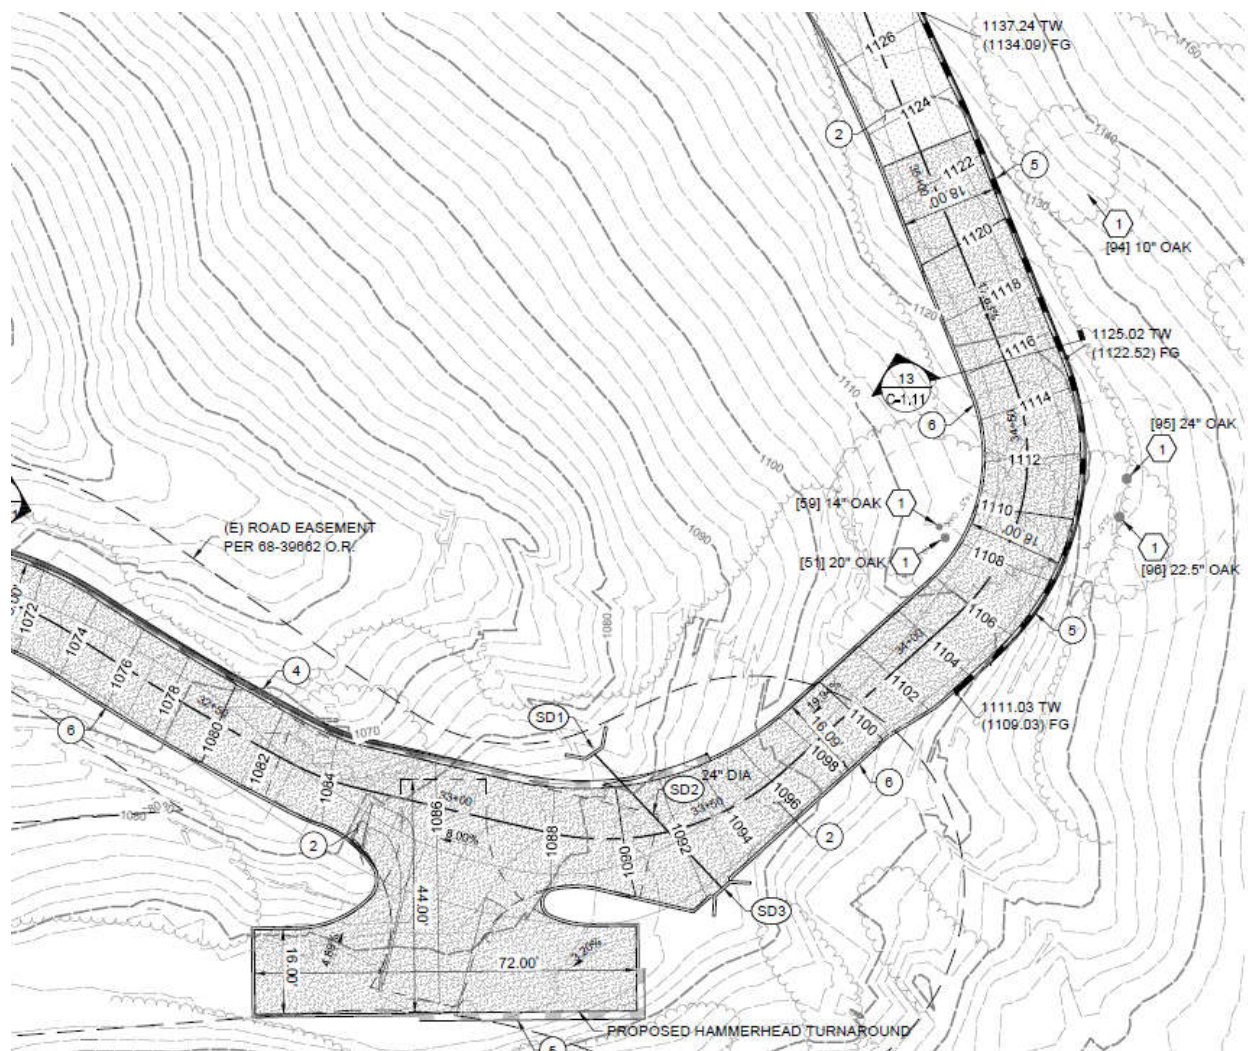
Plan section C-1.9 shows four oak trees located on both sides of a road curve.
